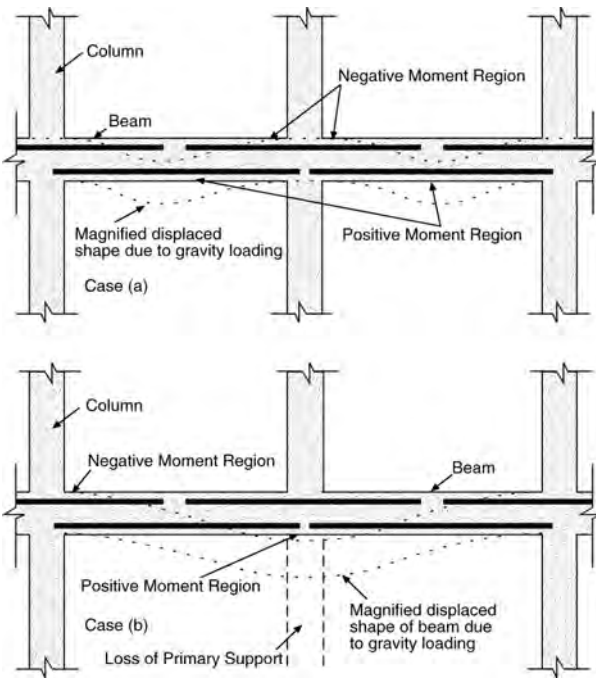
Lack of continuous reinforcement across the beam-to-column connection can lead to progressive collapse. (See Reference 4 on page 6)
